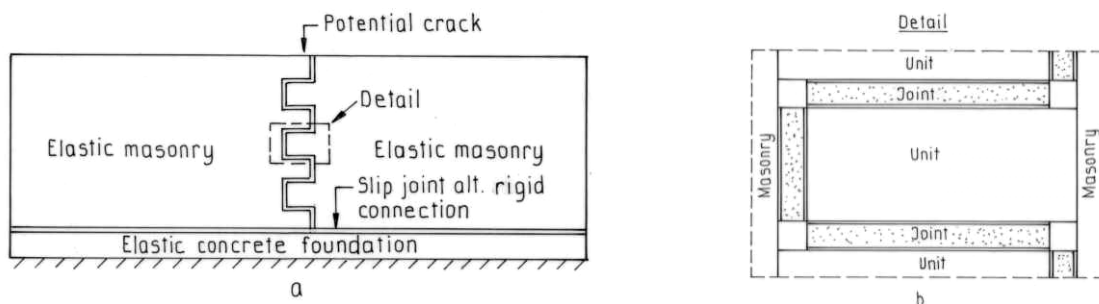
Massive masonry wall on concrete foundation-geometry, boundary conditions and modelling details.
